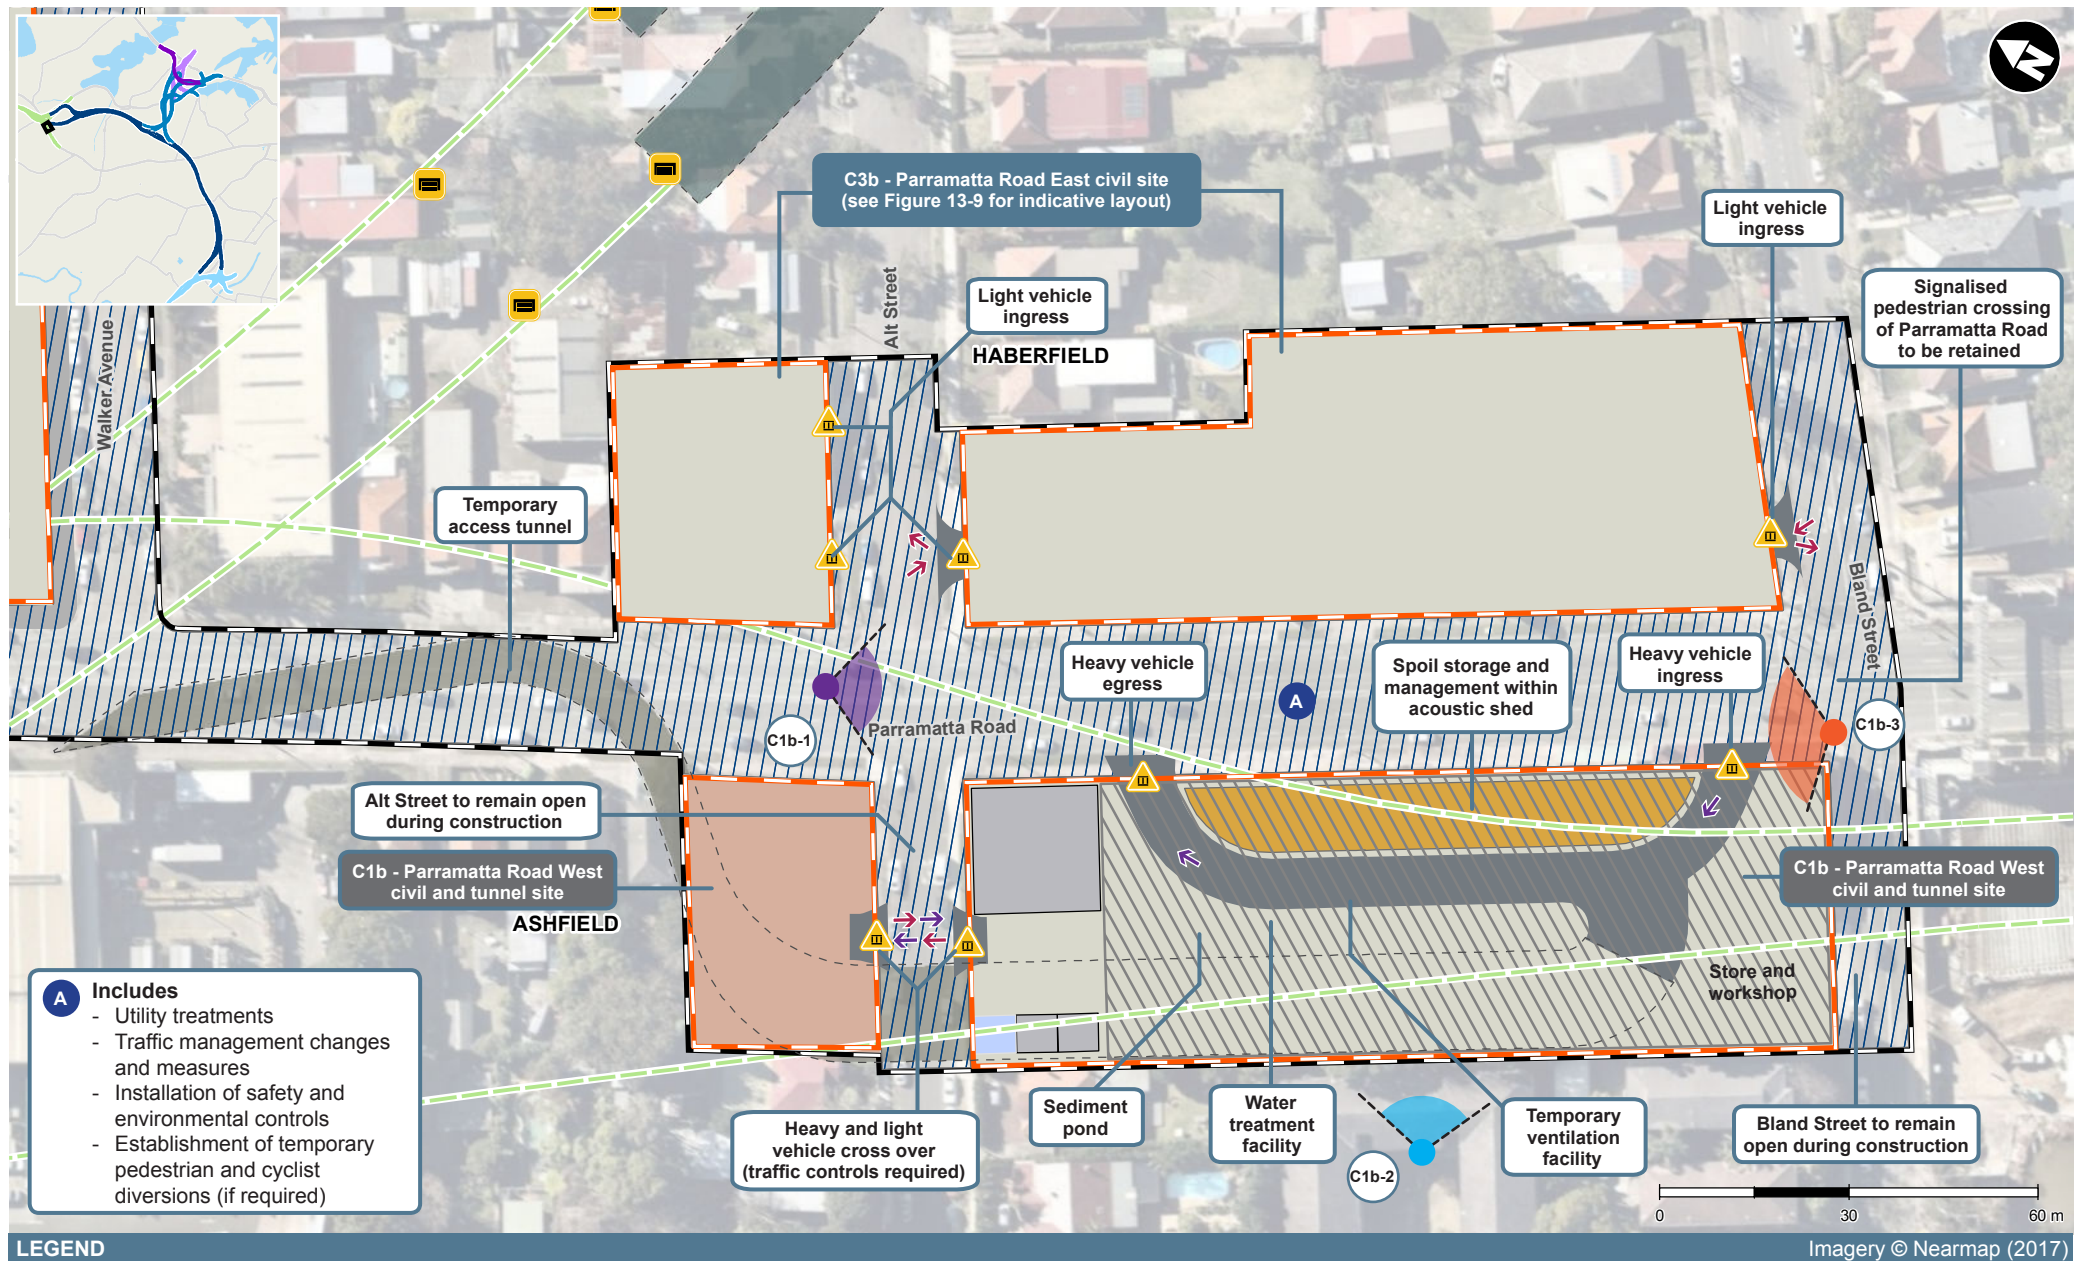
Parramatta Road West civil and tunnel site (C1b) representative receiver locations
